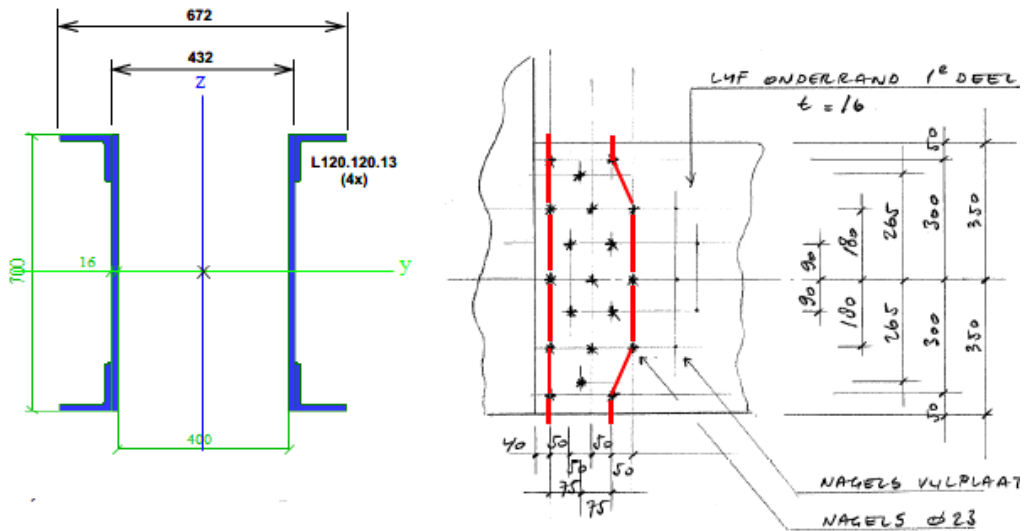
Considered cross-section longitudinal beam at cut I-I, with net cross-section marked in red
